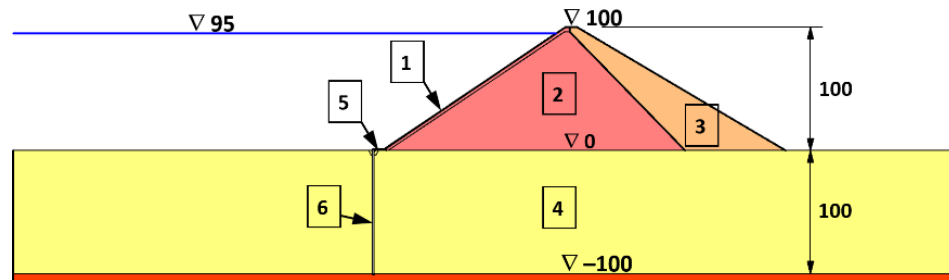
Diagram of concrete face rockfill dam located on deformed foundation layer:
